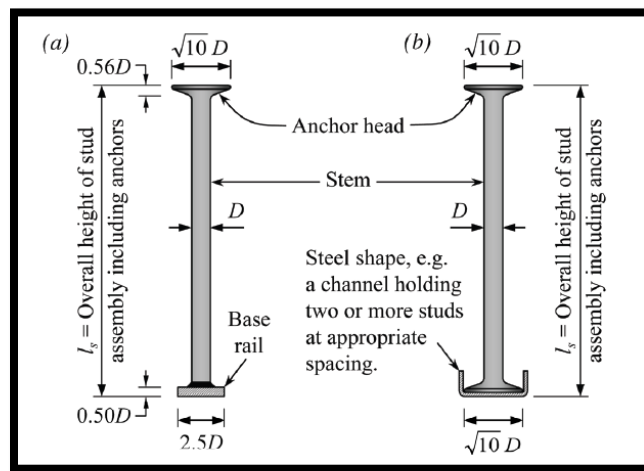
Shear Stud Dimensions Recommendations
